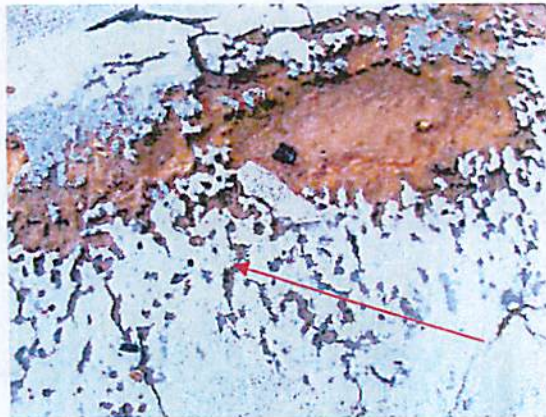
View of white mastic (HA-O) on spray foam on the roof.
